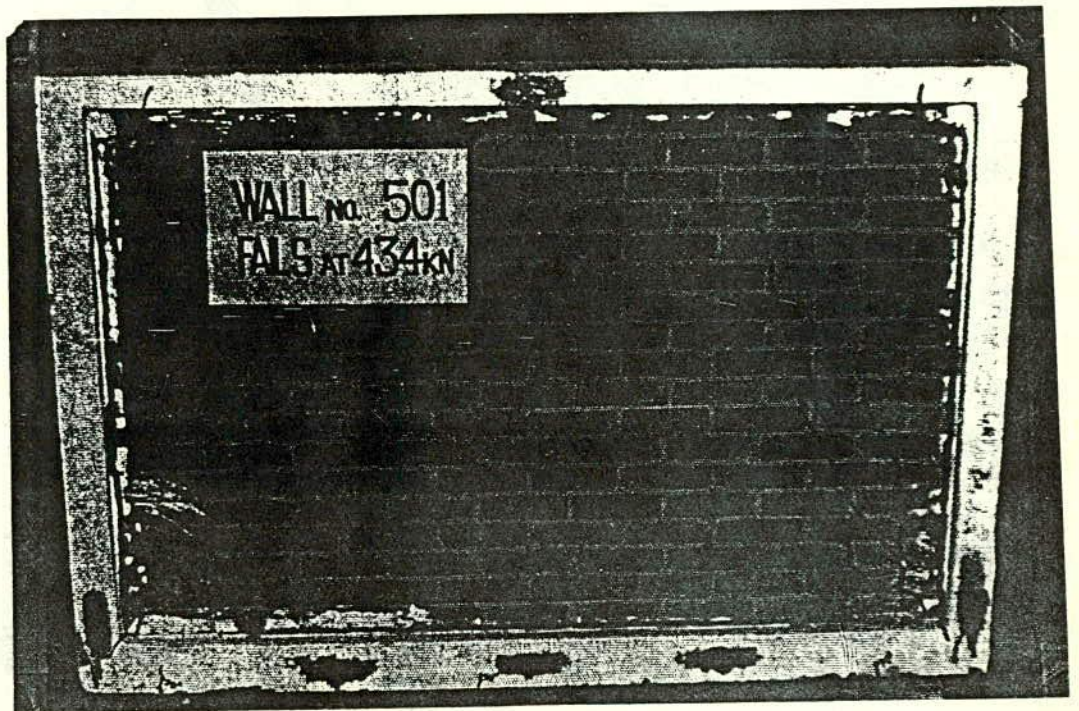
(b) Failure of Wall-beam Panel with frame (back side)
